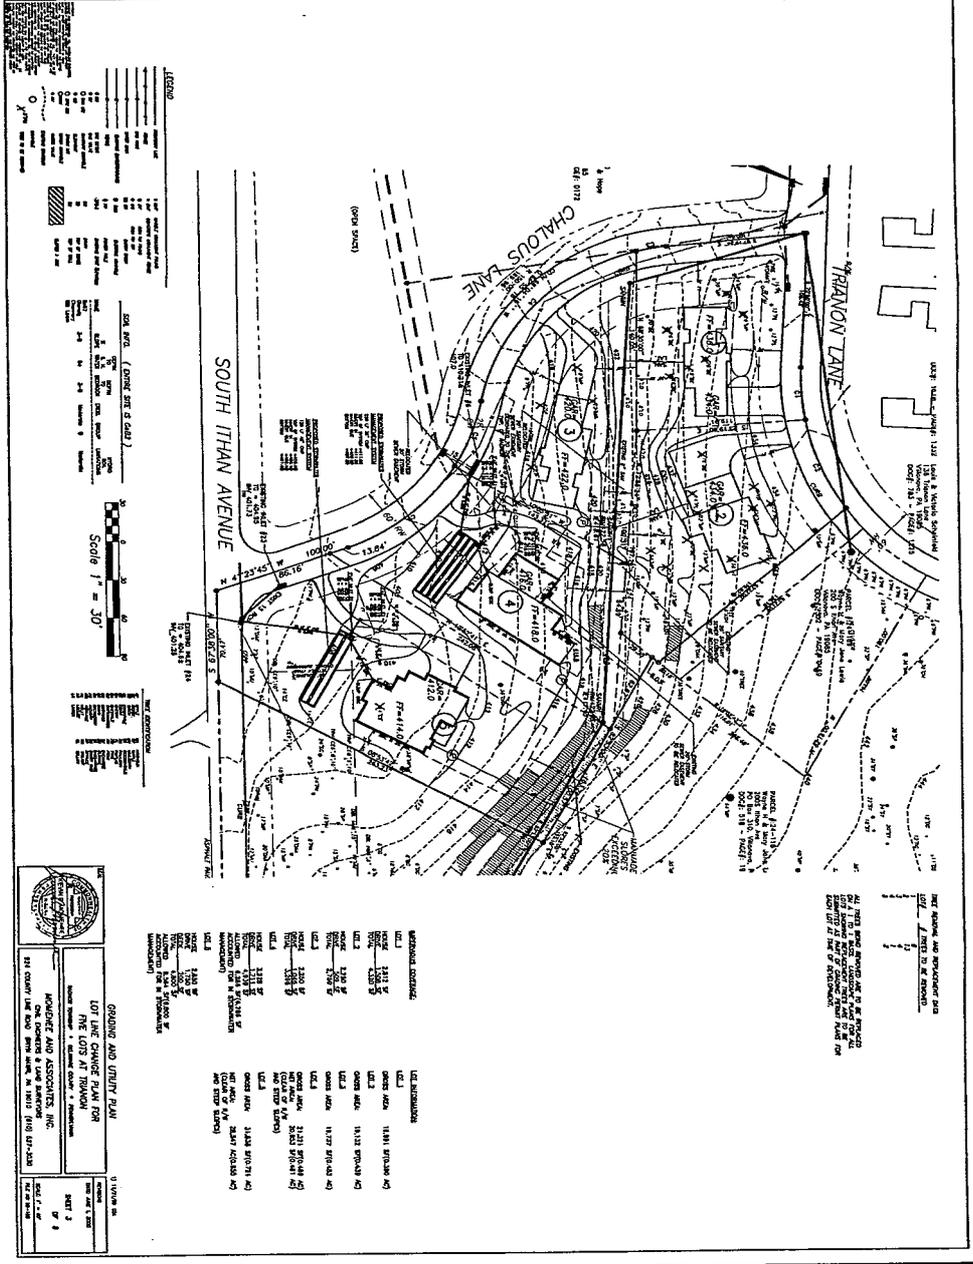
EXHIBIT A - SOIL STORAGE CONTROL PLAN
